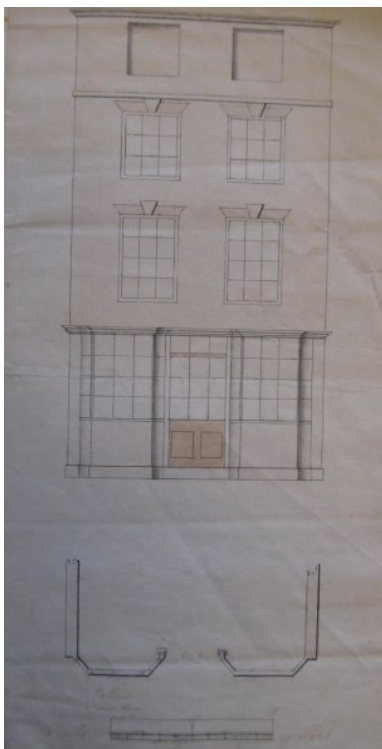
Elevation proposed for No. 36 High Street, probably of about 1758 (SCLA, BRU 15/18/64).
